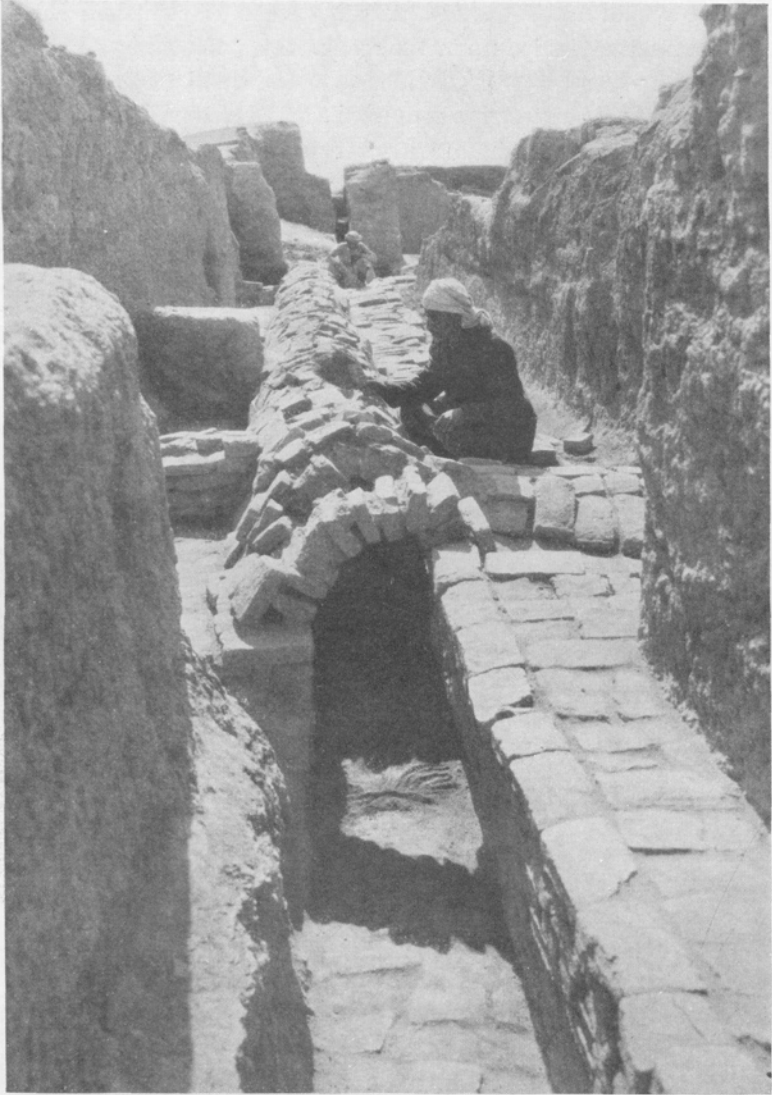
Palace toilet drain from 3 E 15 joining main sewer. The vaulting of the sewer had collapsed from this point onward, but that of the drain joining it can be seen on the right in front of the workman.
